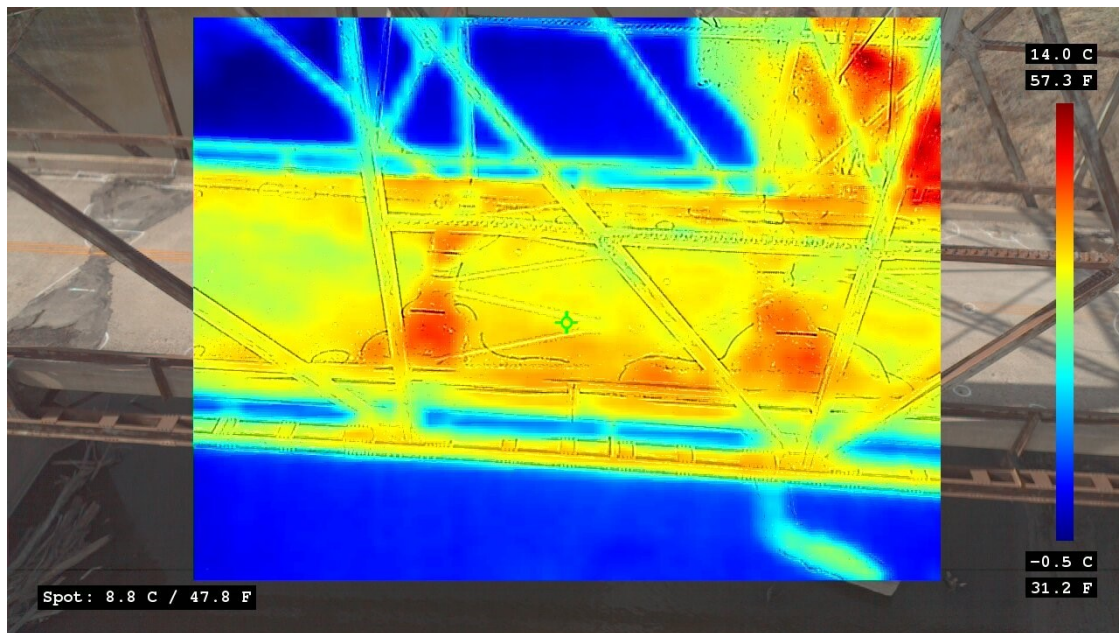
Bridge 5767 Deck Drone Thermal Image.
